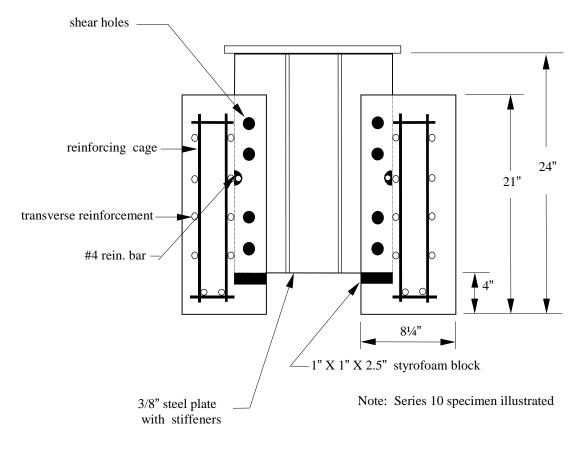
Details of push-out specimen (1 in=25.4 mm)
